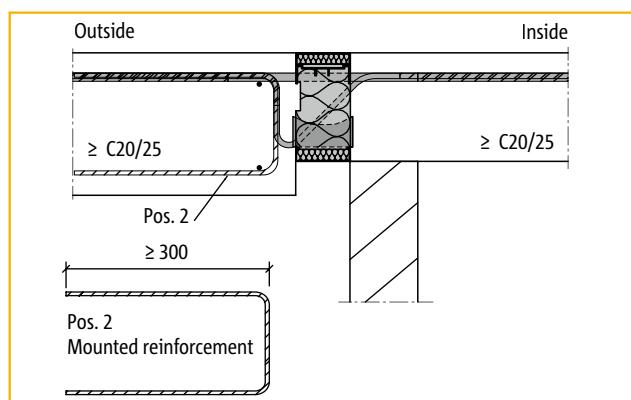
Schöck Isokorb® type K.. additional reinforcement Pos. 2
